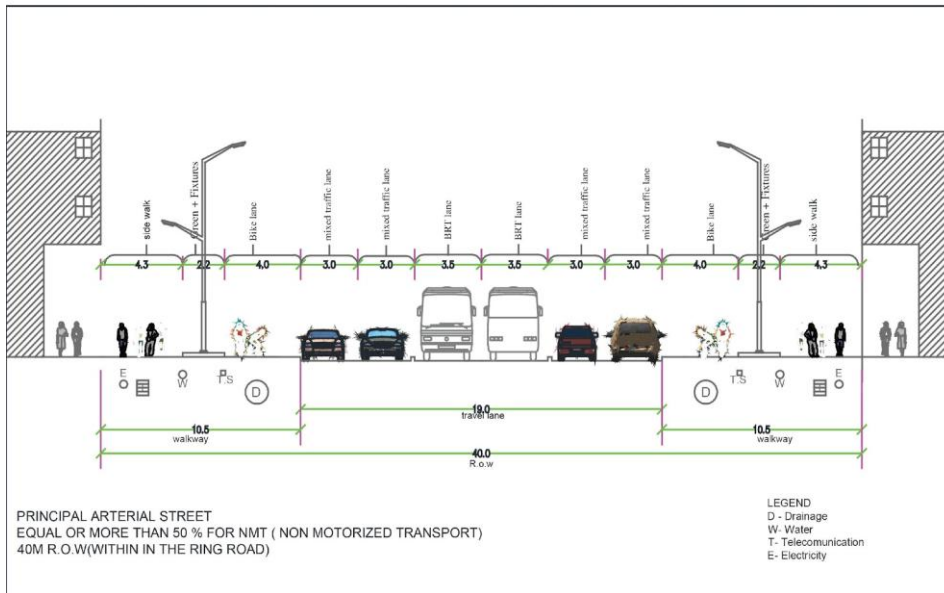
Street section (a) of Principal Arterial Road inside the inner ring road
